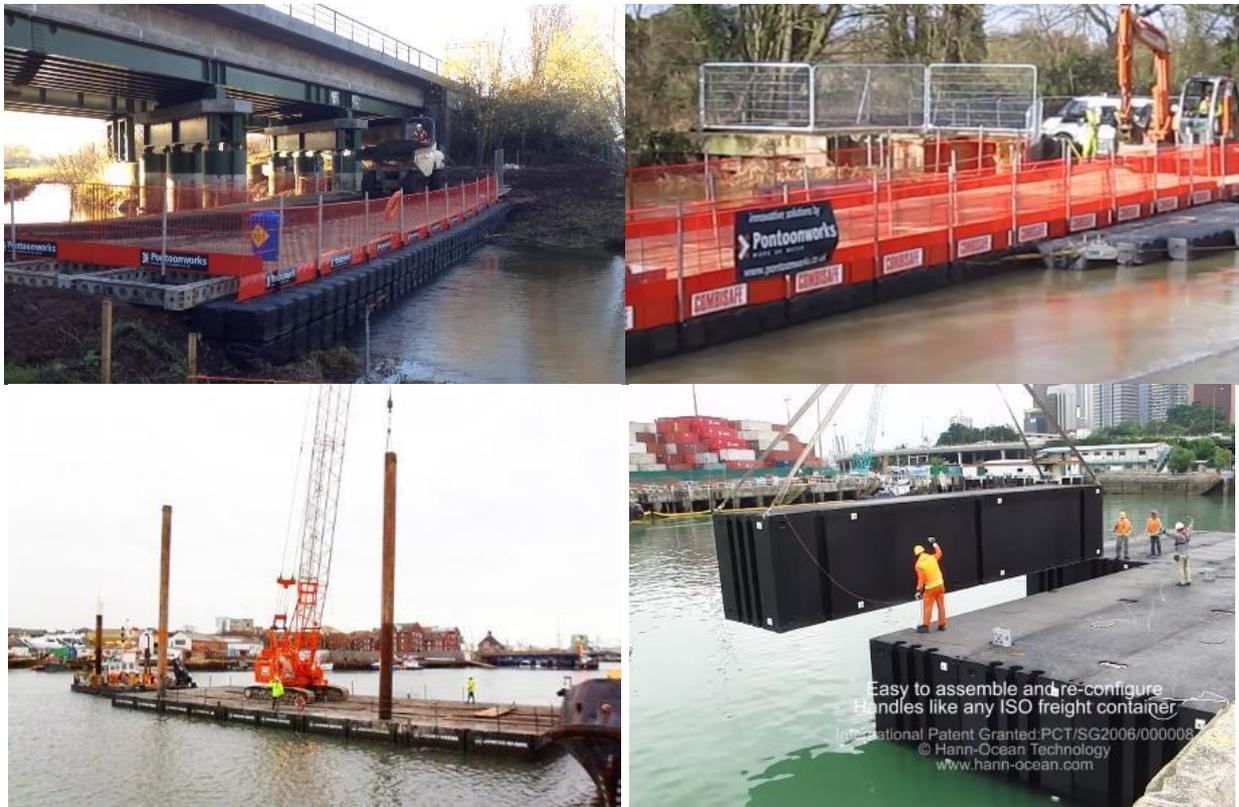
Examples of Modular Pontoons / Floating Causeways / Platform
